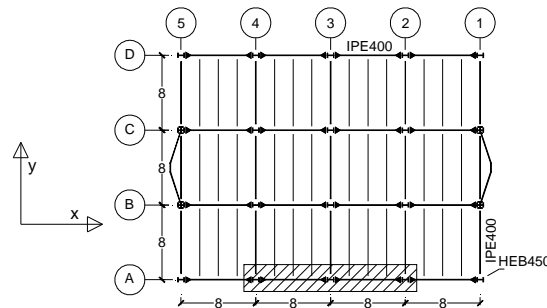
Reference building layout plan with position of extracted specimens for testing
